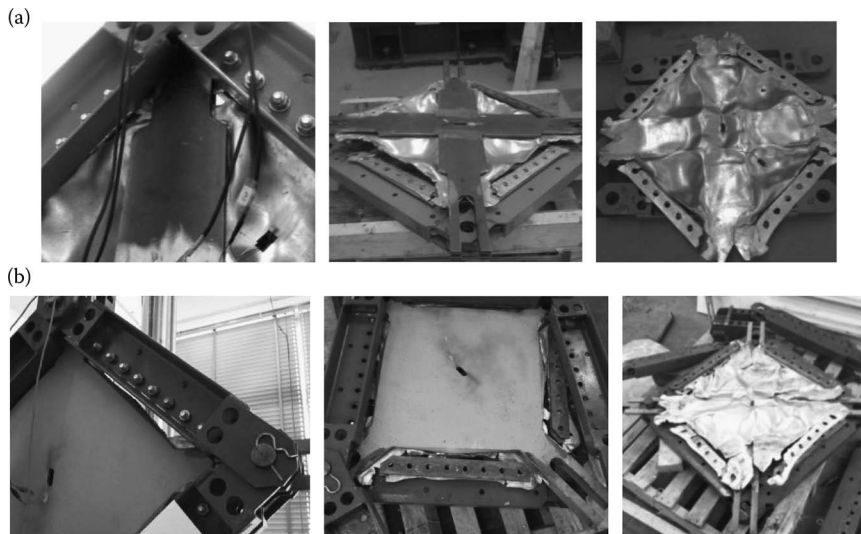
Collapse modes of tested specimen: (a) p-BIP and (b) t-BIP.
